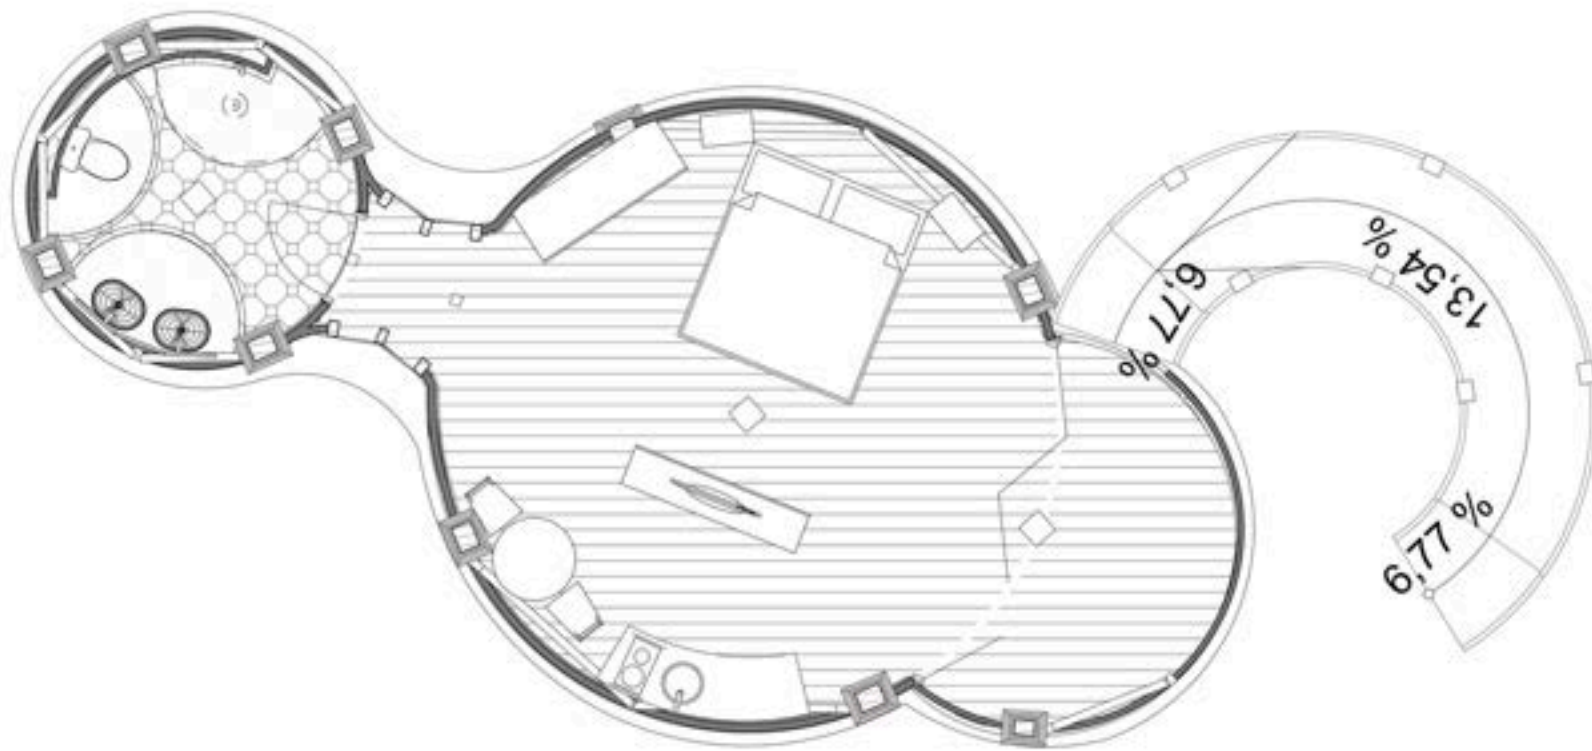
Tentrem Guest Room Ground Floor Plan
